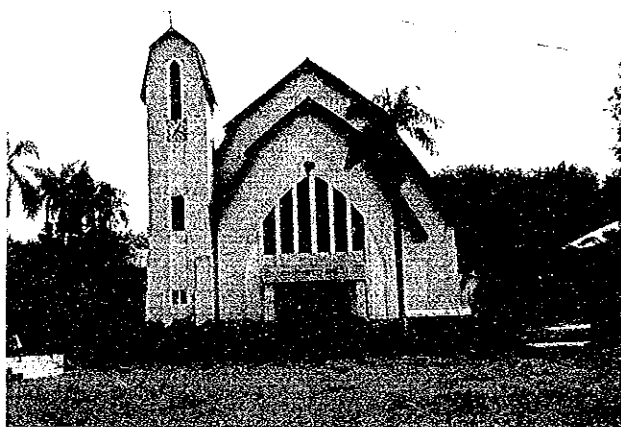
Medium Level Damage of Masonry Church
